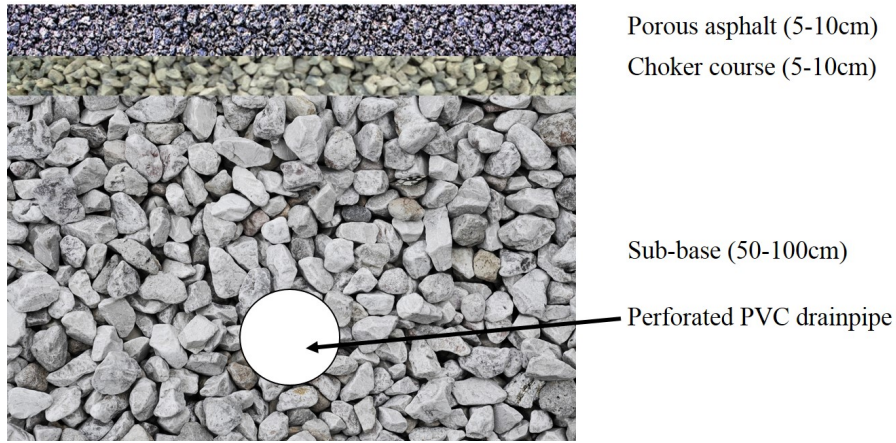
Cross section diagram of typical permeable pavement, showing upper infiltration layers and infiltrate reservoir. Native soil underlies this sub-base layer.
